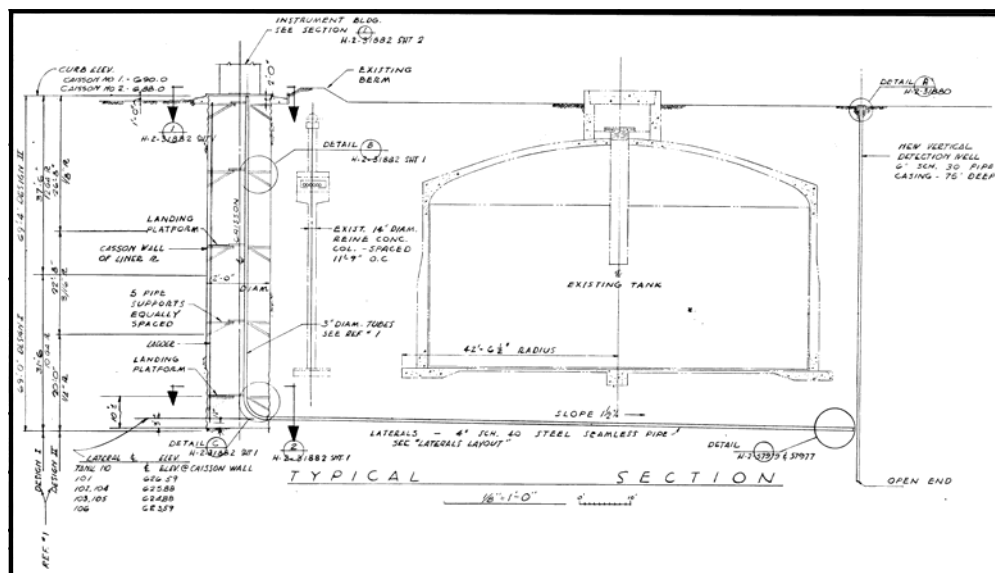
Drawing of a typical section of a lateral installation in the “A” Tank Farm, from Hanford drawing# H-2-31880
